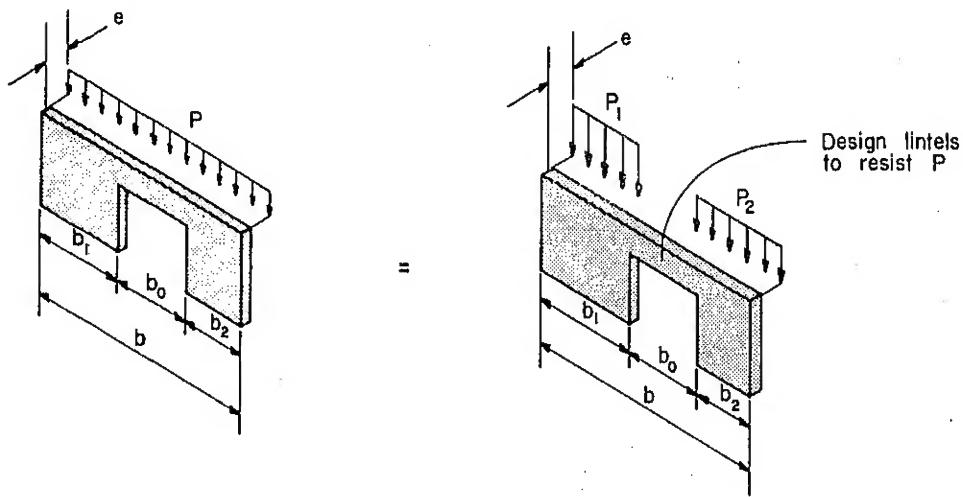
Equivalent Loadings for Wall Panels with Large Openings
